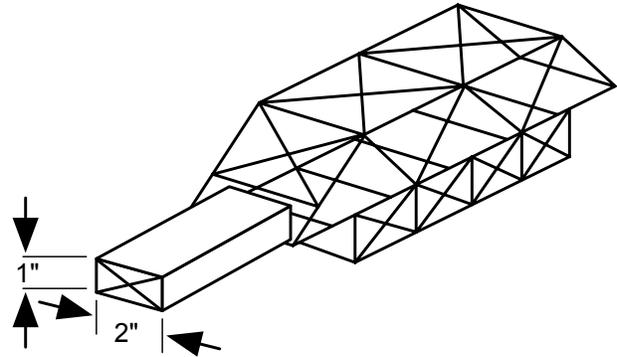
Diagram showing placement of the test block into the bridge roadway
